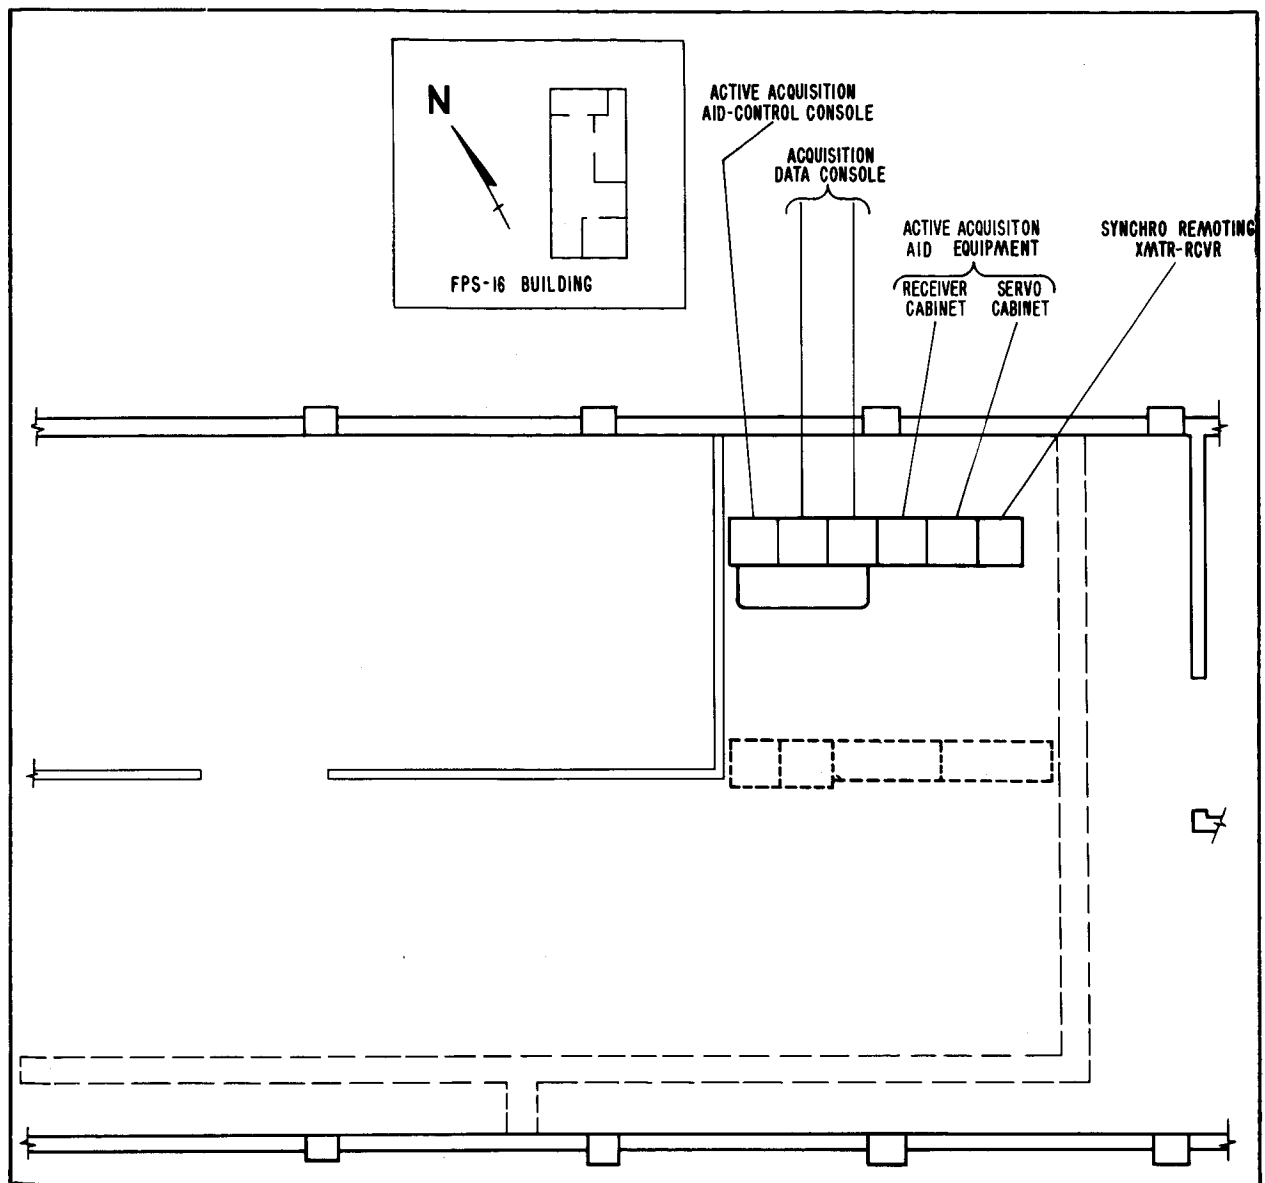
Acquisition System Equipment Layout, FPS-16 Building, Coopers Island
